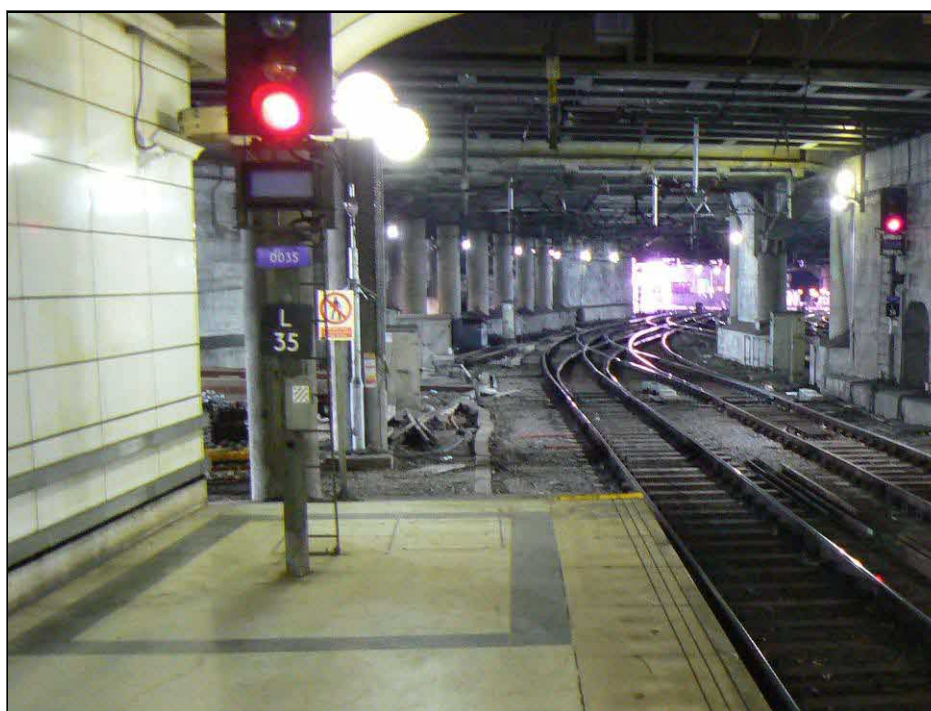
View from under the vehicle access ramp looking towards the railway alignment / junction area
